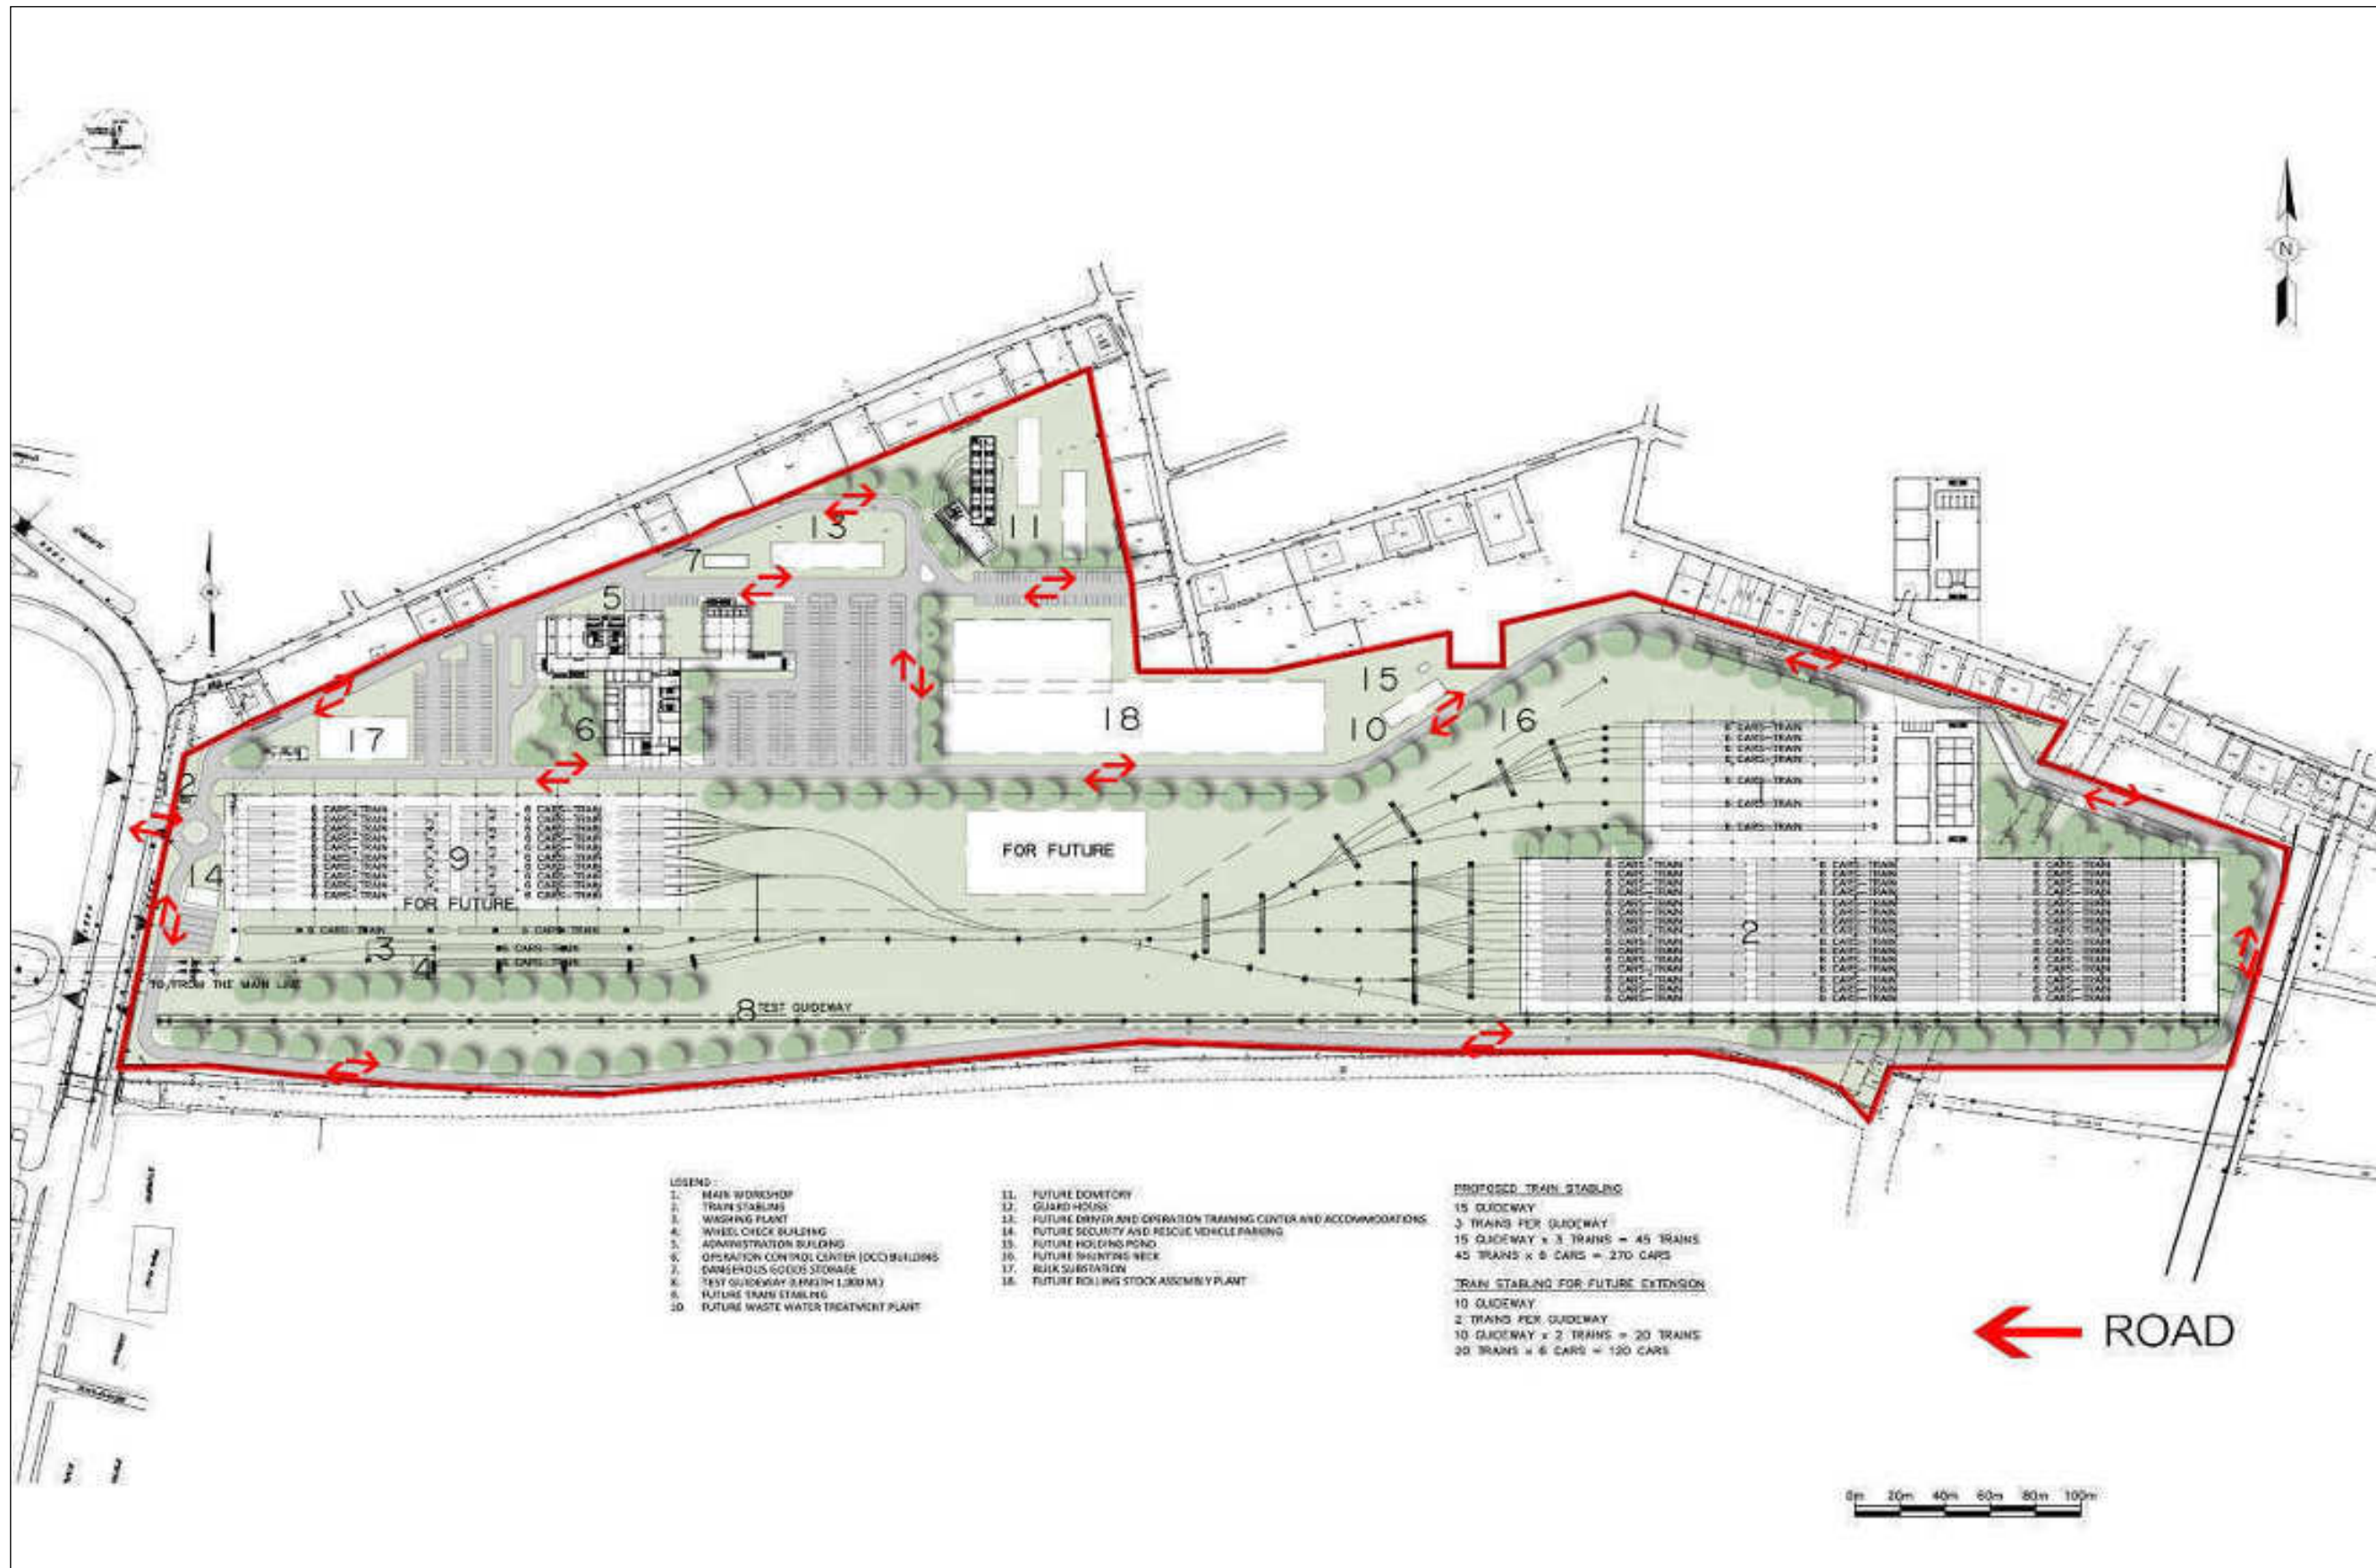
1 Lay out plan of the road around depot area.
